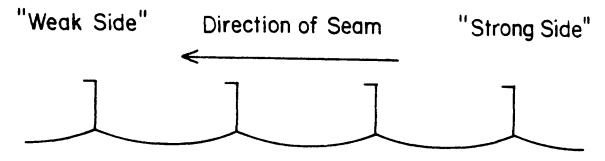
"Weak side" of the four-panel cross section observed in testing.
